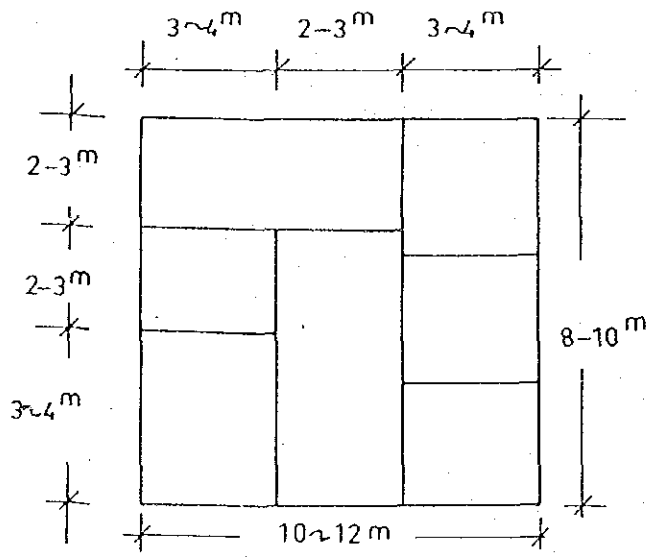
TYPICAL FLOOR PLAN FOR TIMBER FRAME BUILDINGS
